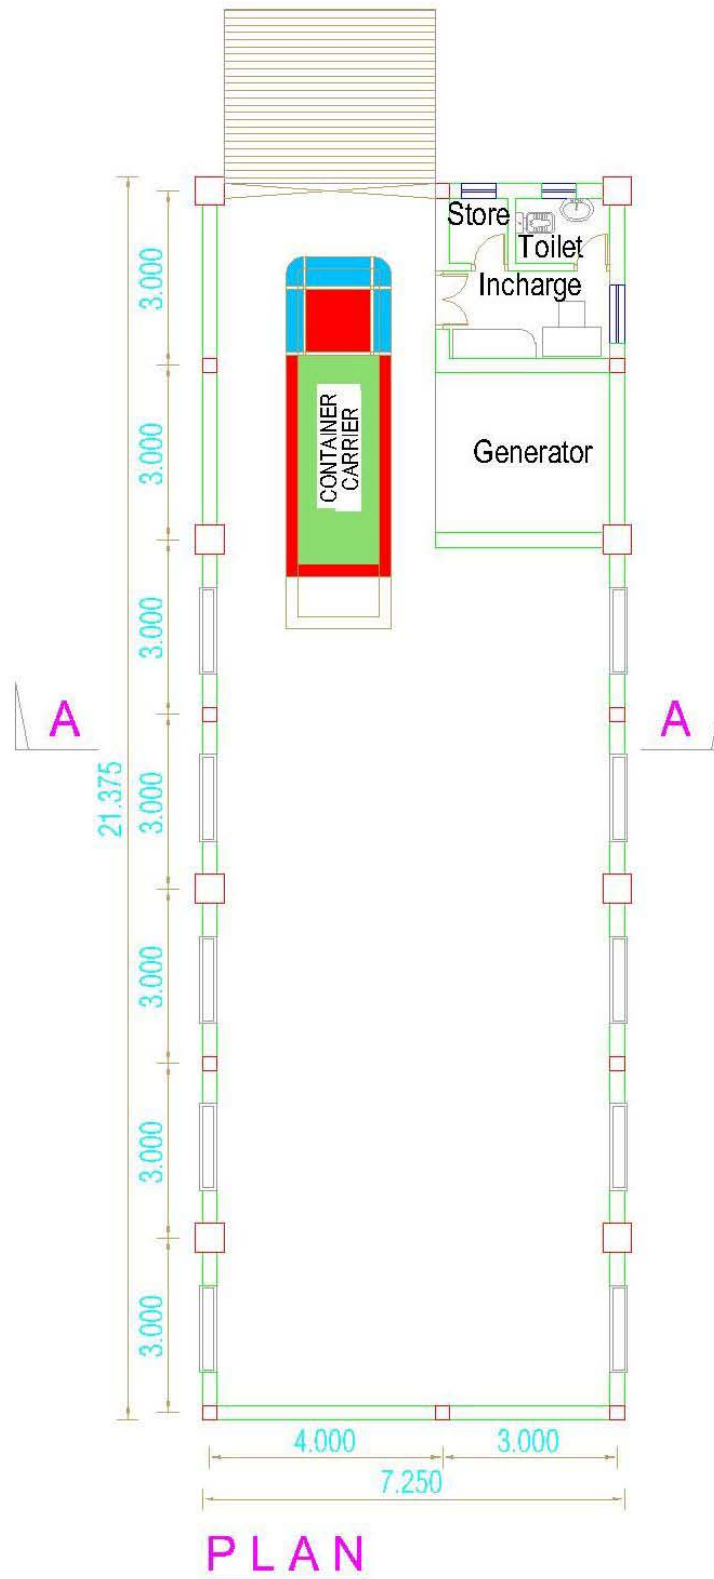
STS – 9 Port Connecting Road Preliminary Plan
